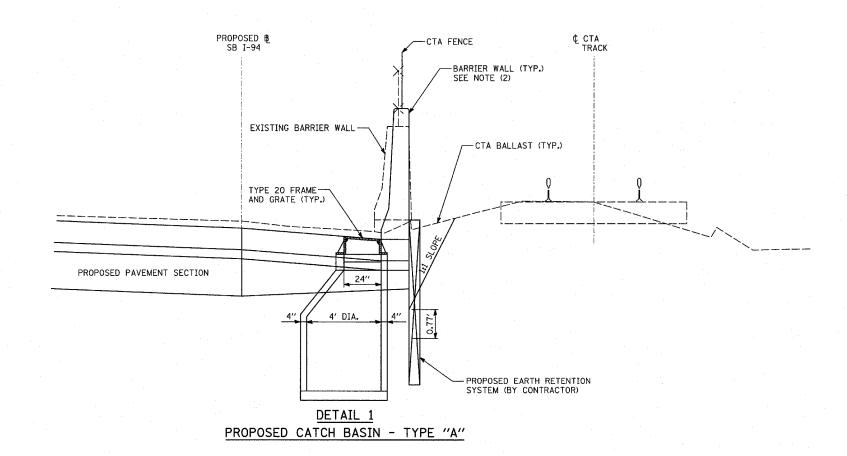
PROPOSED CATCH BASIN - TYPE "A" 1. SLOPE SHOULDER AREA BETWEEN PROPOSED CATCH BASIN AND BARRIER WALL TOWARDS GRATE - TRANSITION BACK TO SHOULDER SLOPE WITHIN 10' EITHER WAY FROM © OF GRATE.
